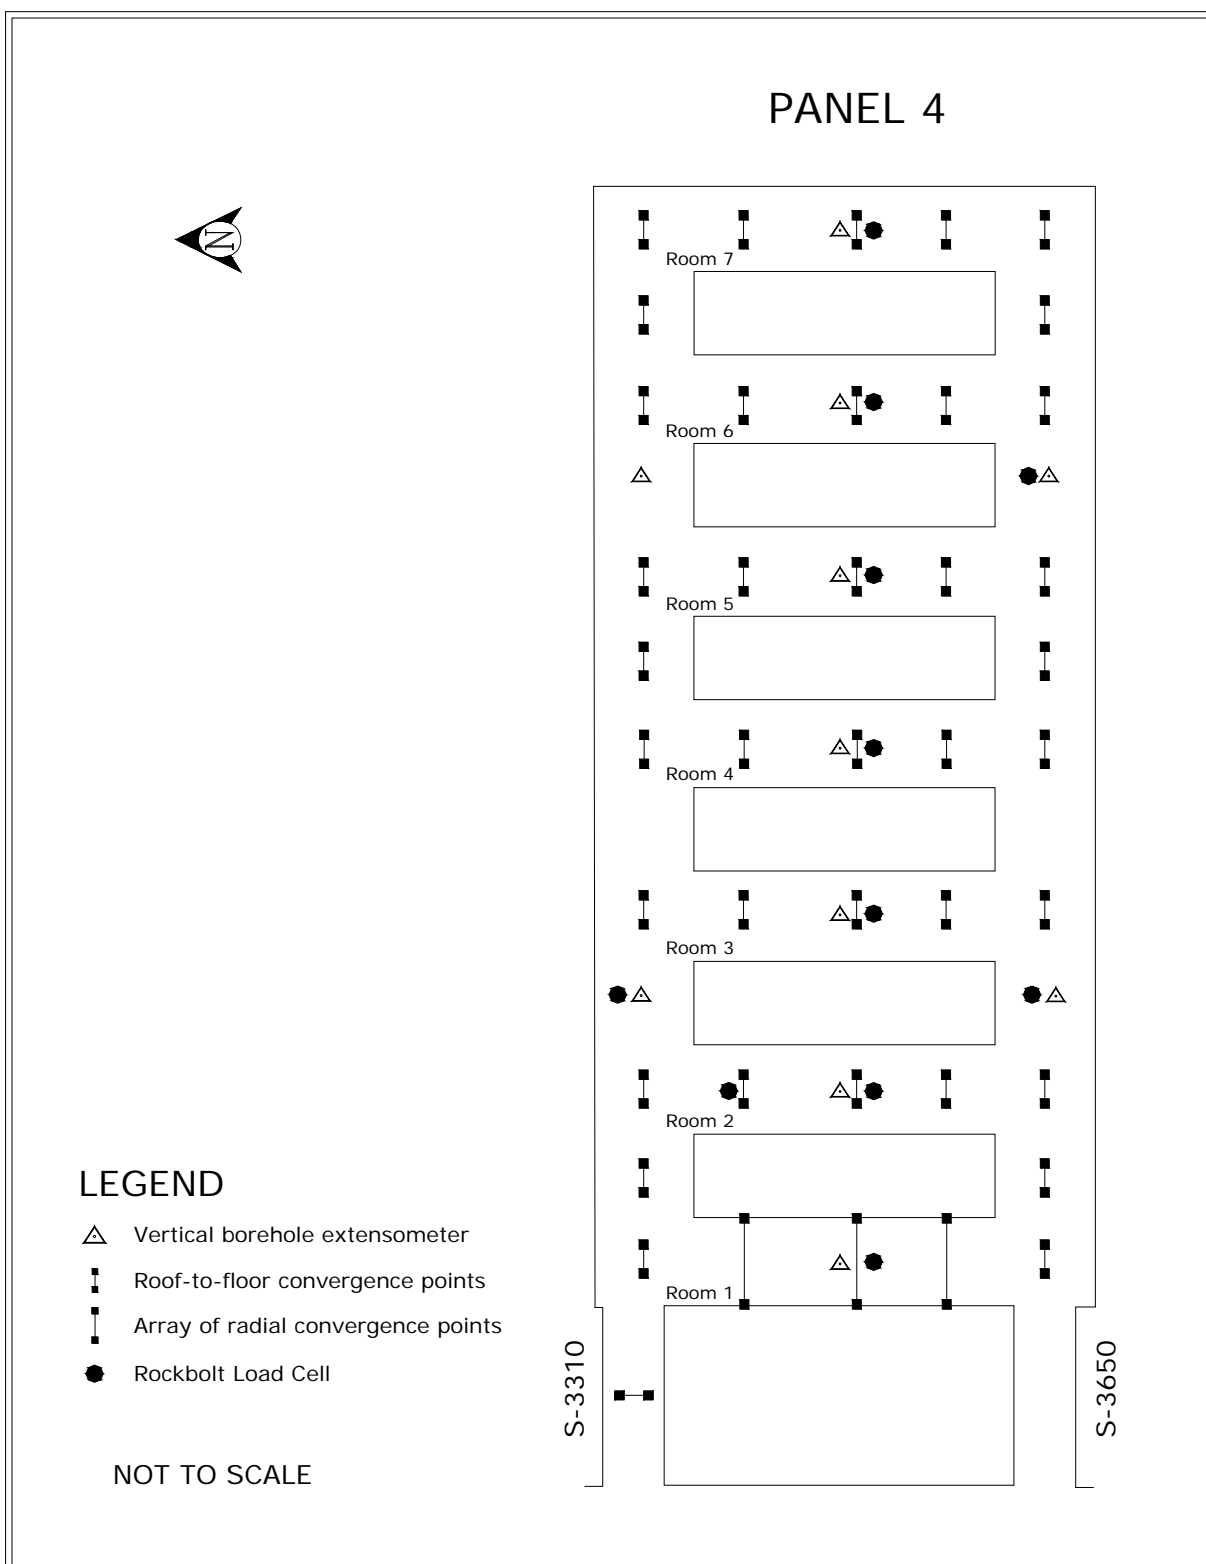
Location of Panel 4 Geotechnical Instruments
